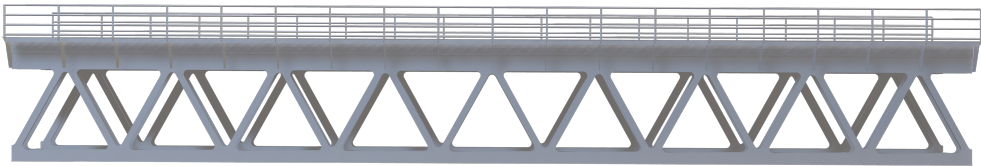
Bridge B5 – truss girder bridge with upper bridge deck and ballast bed.
